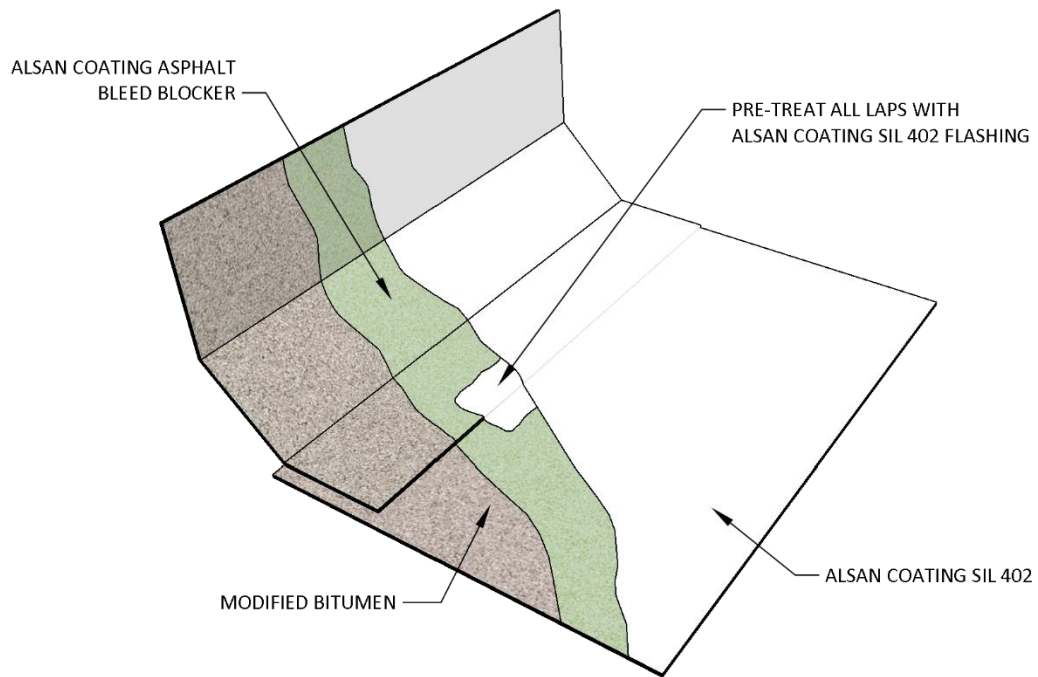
Silicone Roof Coating Over Modified Bitumen, Wall/Curb
